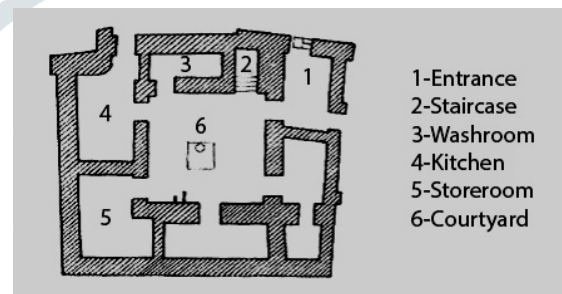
Plan of House at Ur, Mesopotamia (Al-Dawoud, 2006).
